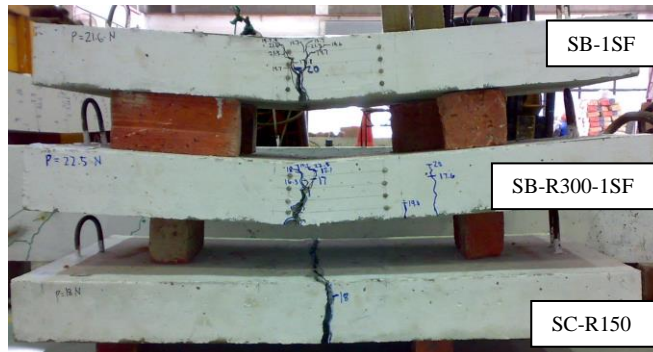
Failure mode of all steel fibre reinforced concrete slabs
